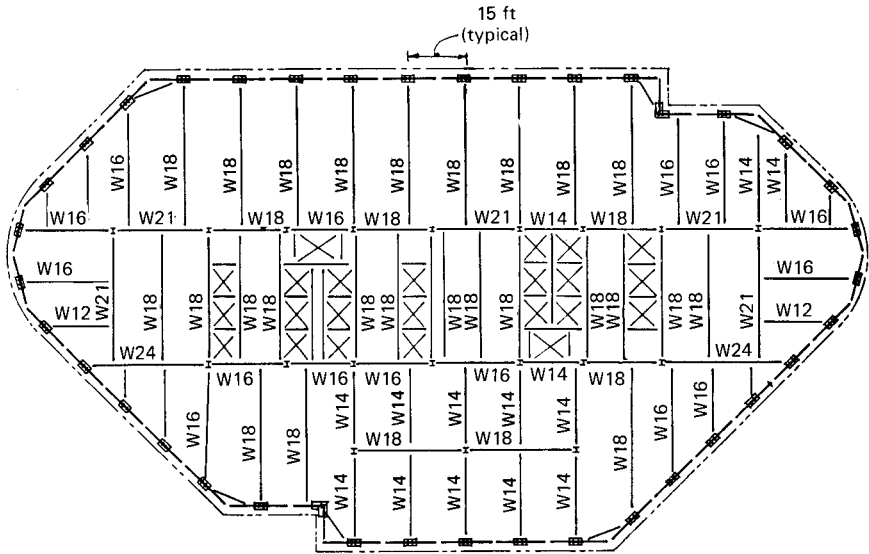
Floor framing plan with 15-ft beam spacings, 3-in deck + 3¹/₄-in slab.
